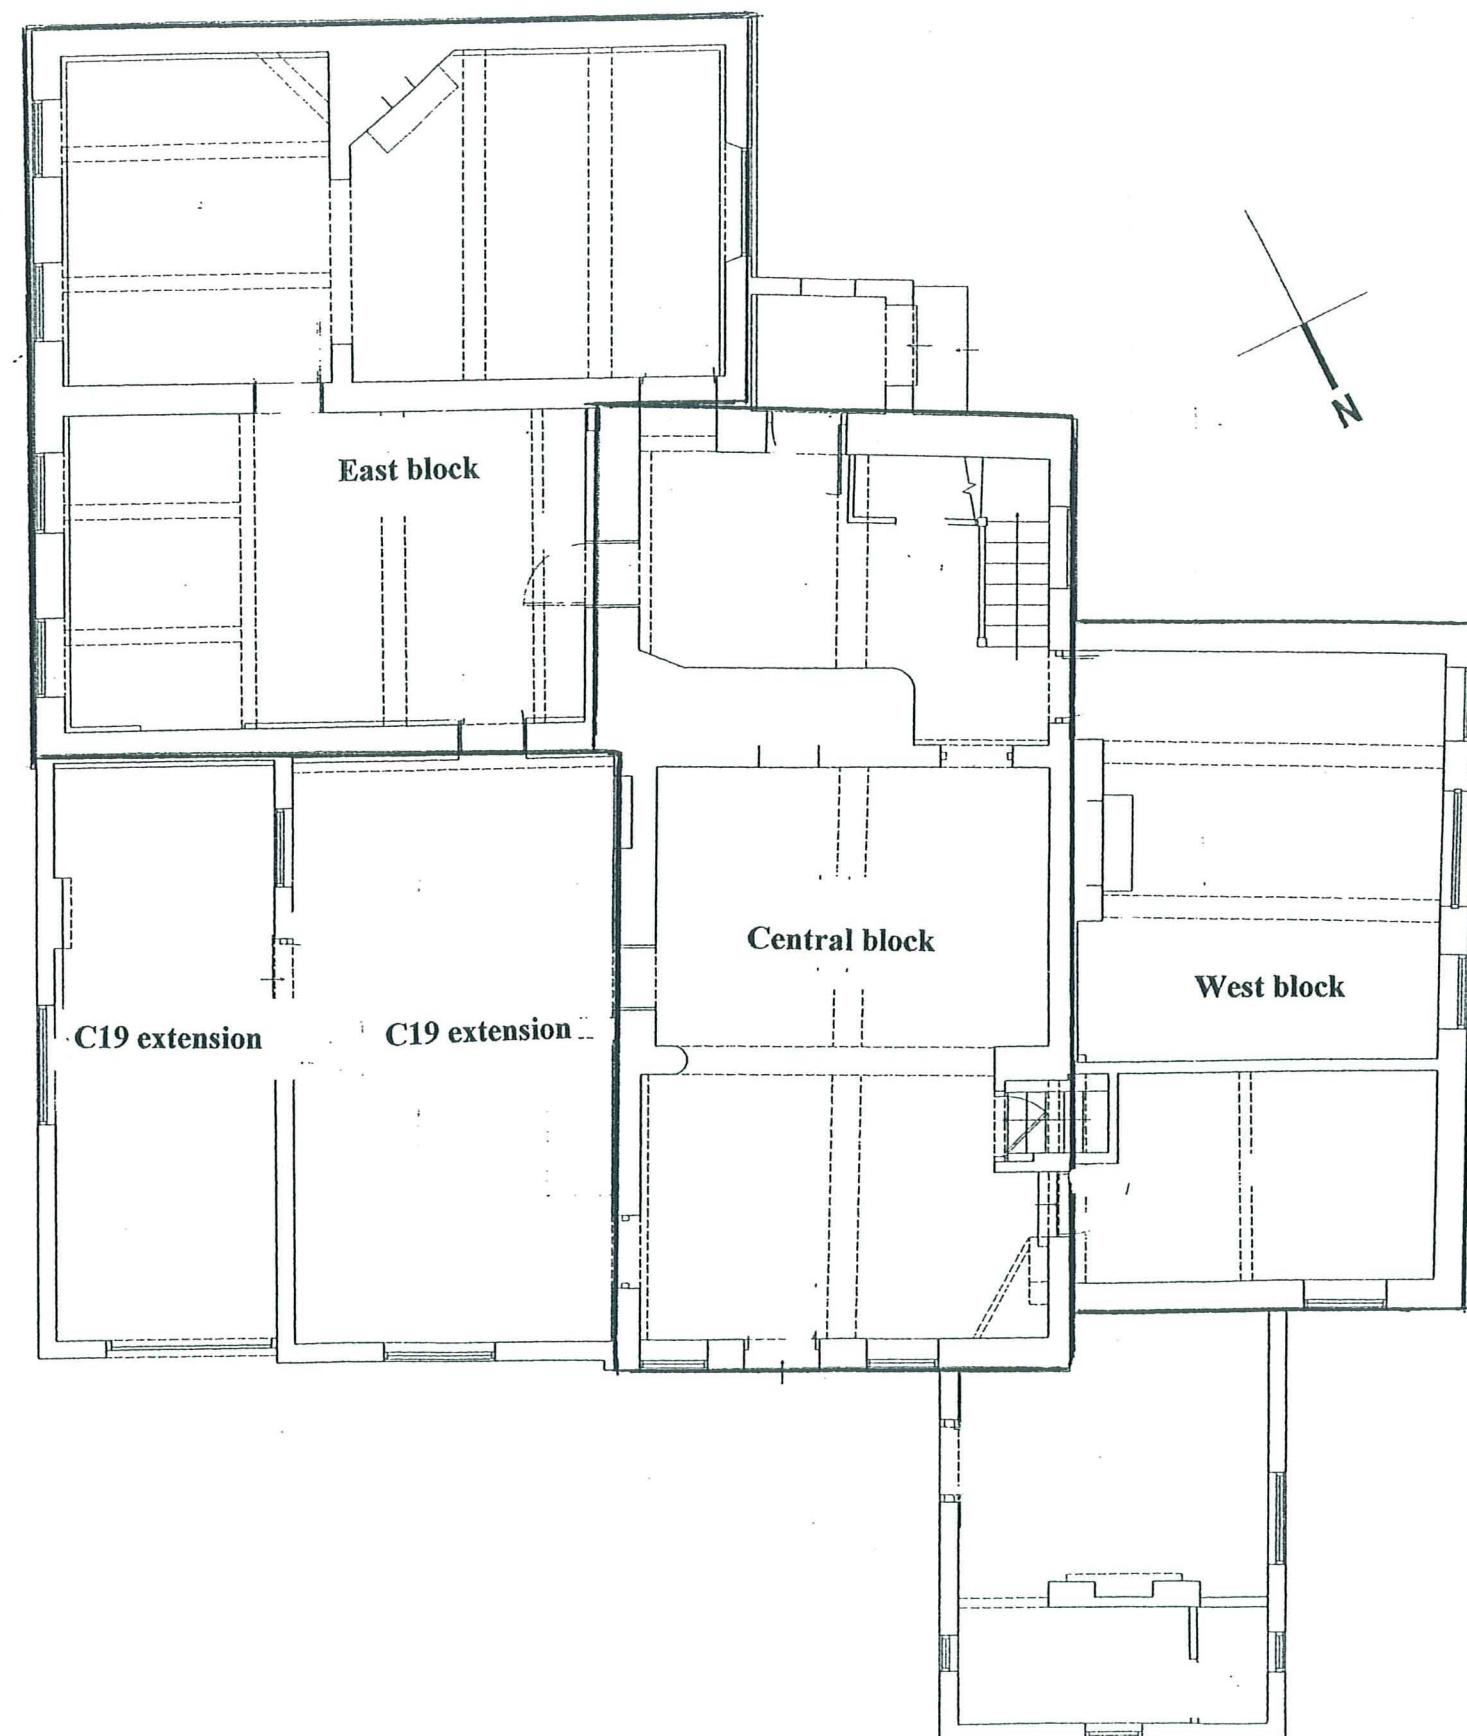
Plan to show approximate location of sampled timbers based on a first-floor plan
